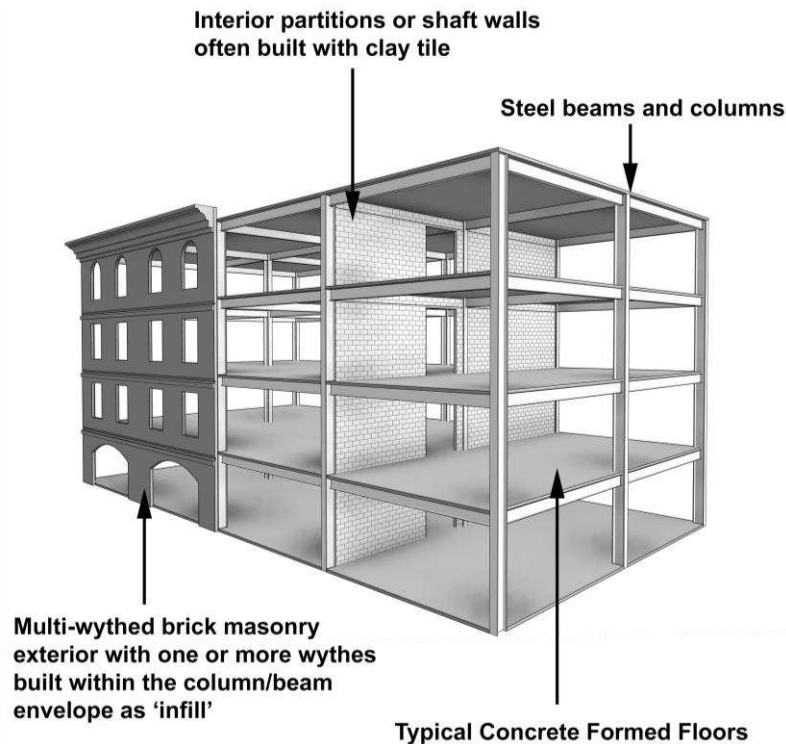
Schematic illustration of an SIW building (Figure adapted from FEMA 547, FEMA, 2006)
